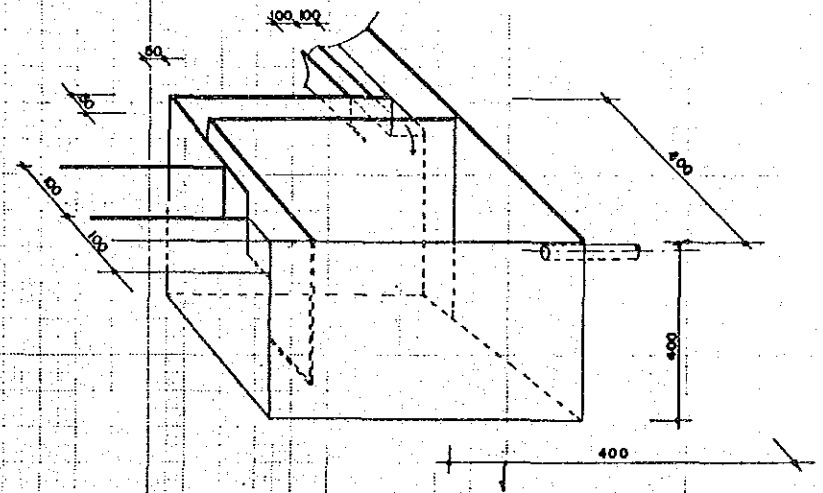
DETAIL OF CANAL ANAEROBIC TANK S = 1:20
